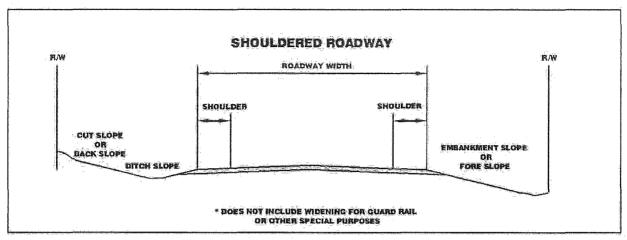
Definition of Roadway Elements. Shoulder Roadway (Does not include widening for guardrail or other special purposes)
